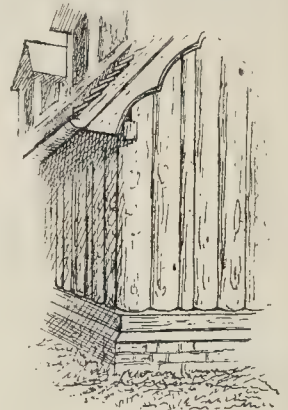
North-west Corner of Greenstead Church, Essex.
